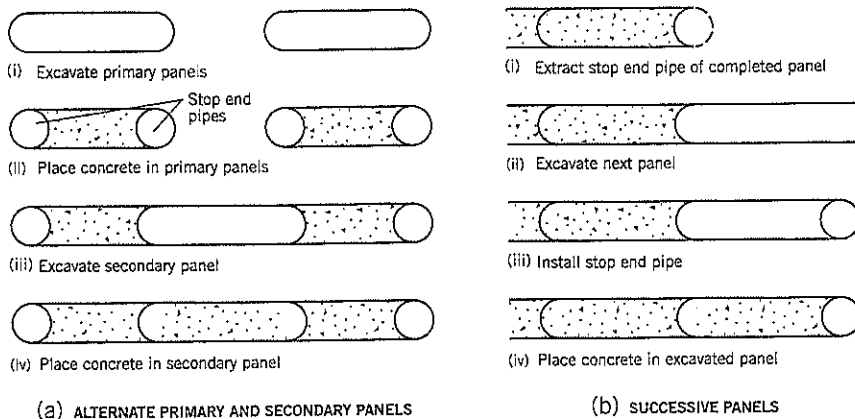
Construction sequences used to build slurry trench walls with stop end pipes.
